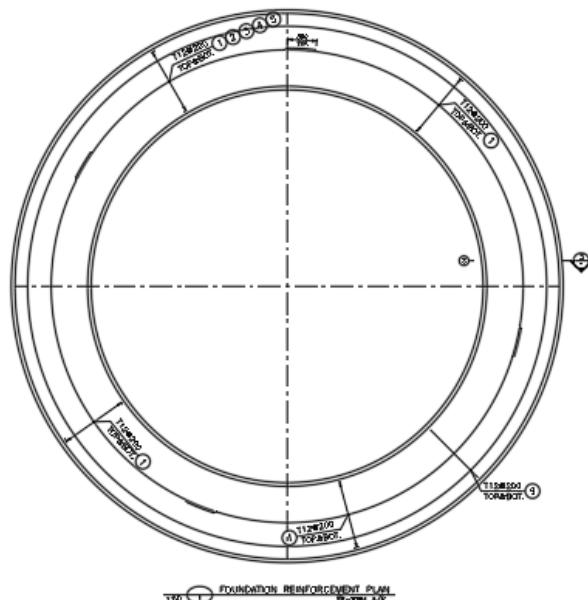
FOUNDATION REINFORCEMENT PLAN
